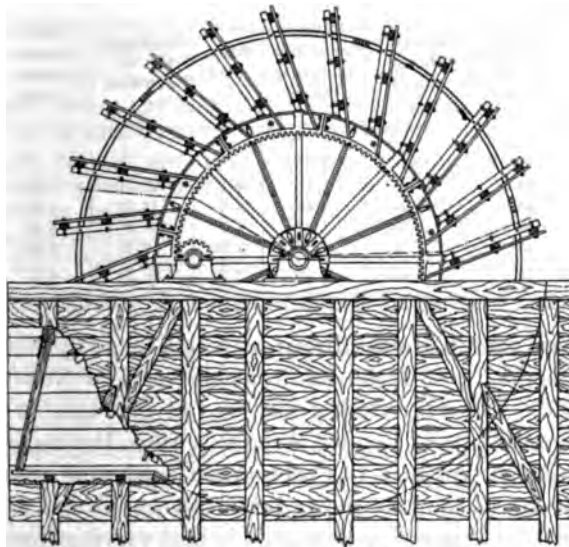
DRAINAGE WHEEL, SOUTH SIDE PLANTING COMPANY
